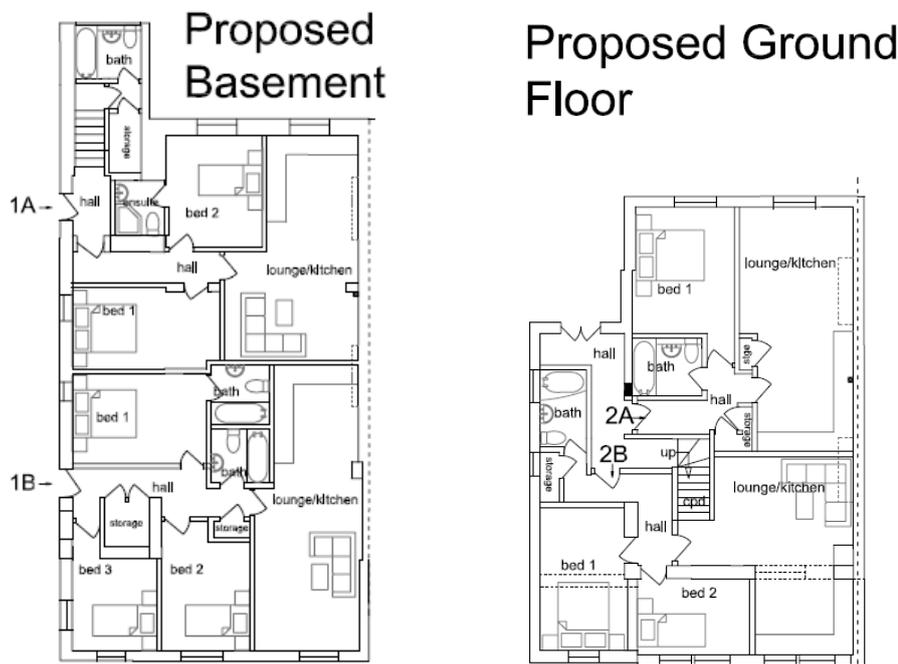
Proposed Basement and Ground Floor Plan showing layout of proposed flats 1A and 2A
